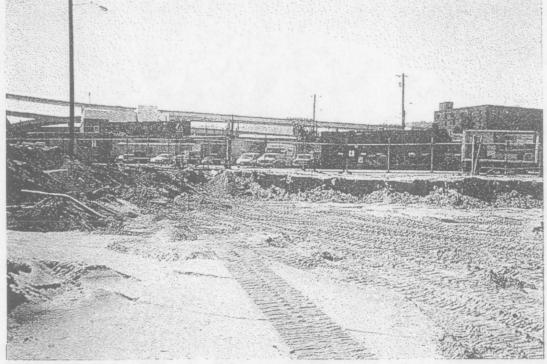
Test pit exploration adjacent to Area 1 (excavation depth 6 feet below ground surface).
